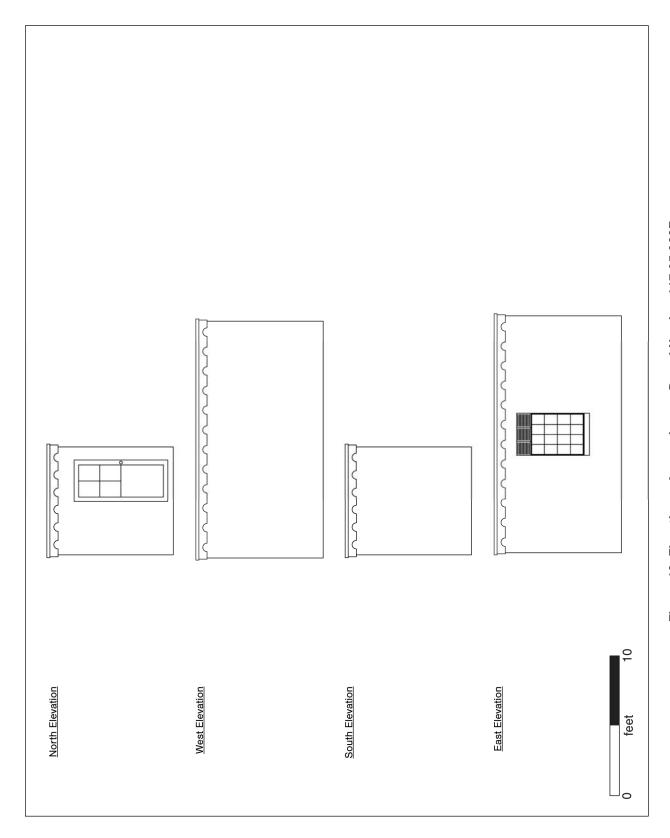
Elevations of pump house, Parcel Number 117-05-068F.
